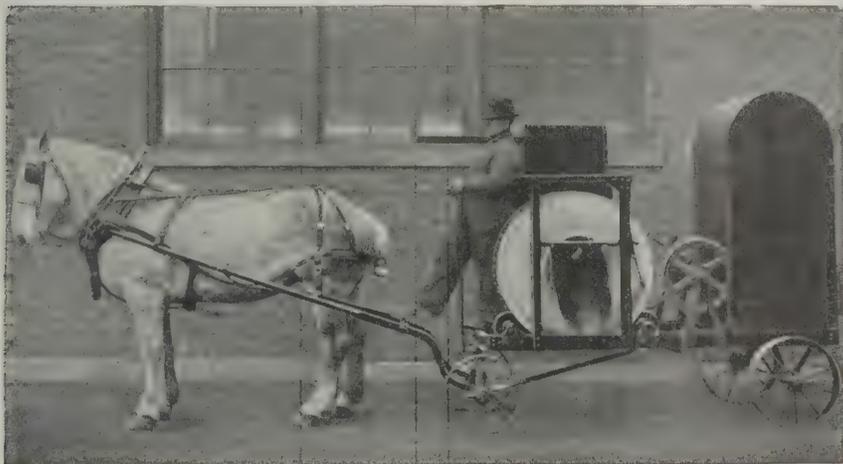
The Chain Belt Concrete Mixer Showing Engine Enclosed and Horse Attached, Ready to Move to Next Job
